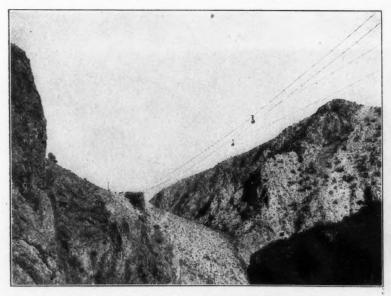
Tramway Crossing Daisy Canyon, Control Stations 15 to 16.
